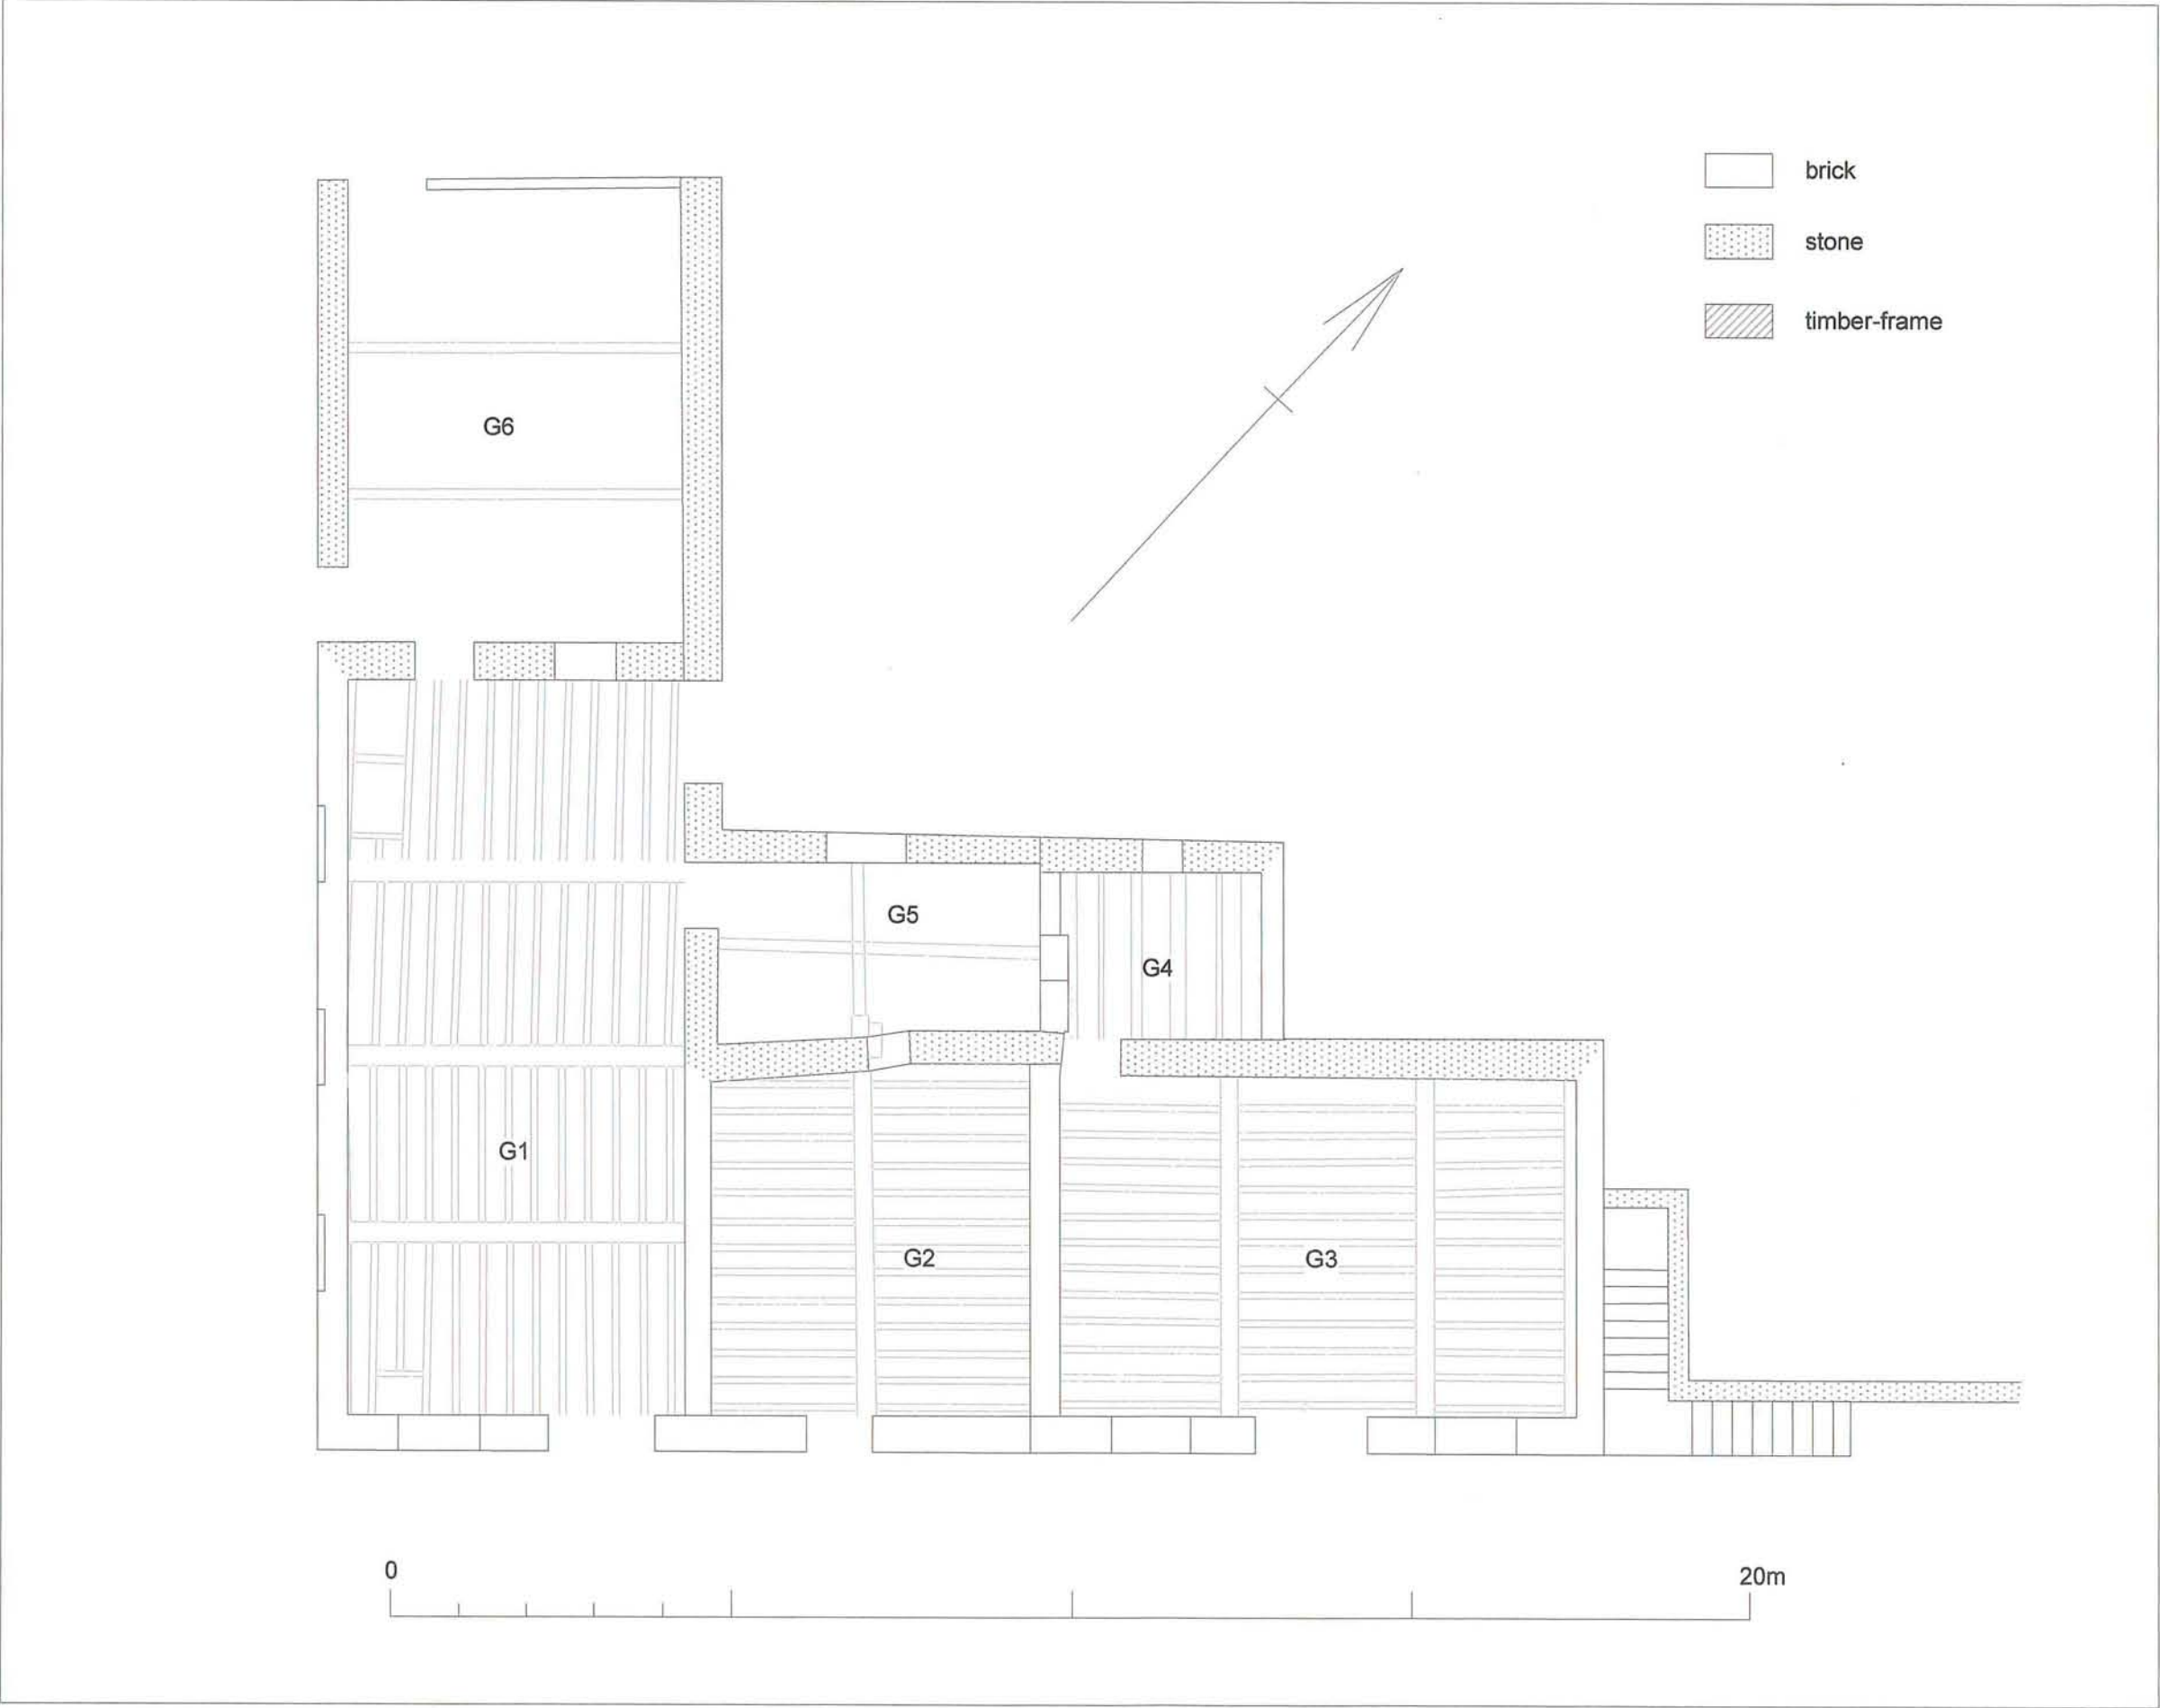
Barn 1 Ground Floor plan, scale 1:100
